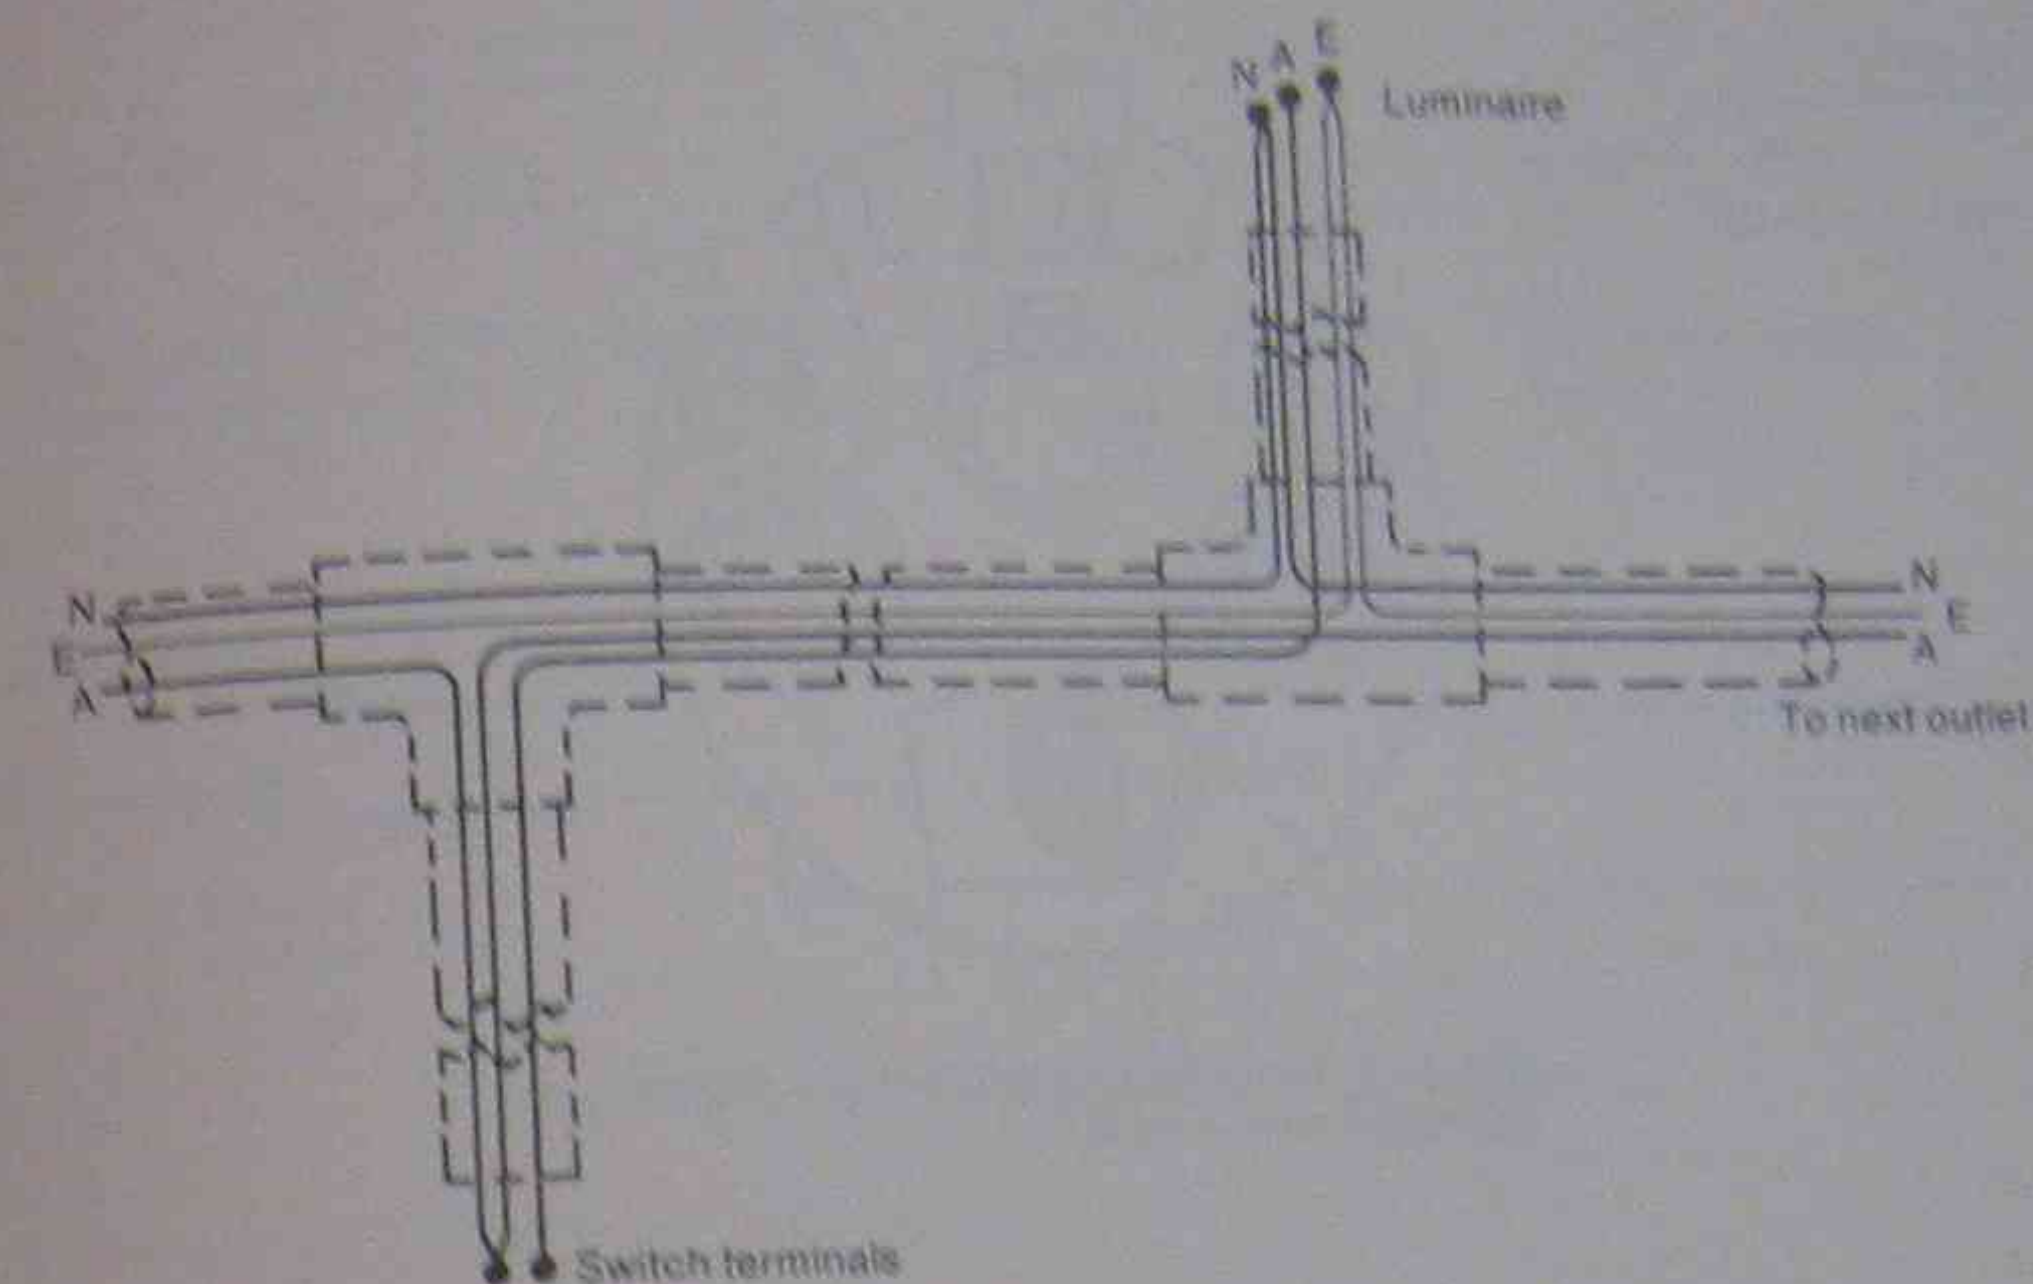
In this surface conduit system, actives are looped at the switch and neutrals and earths at the outlet or luminaire
